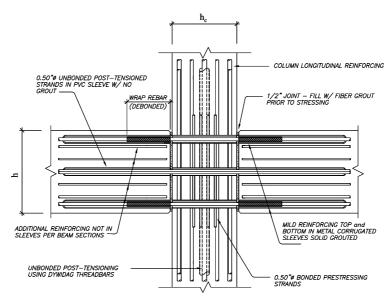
Hybrid frame connection (Transverse reinforcement is not shown for clarity).
